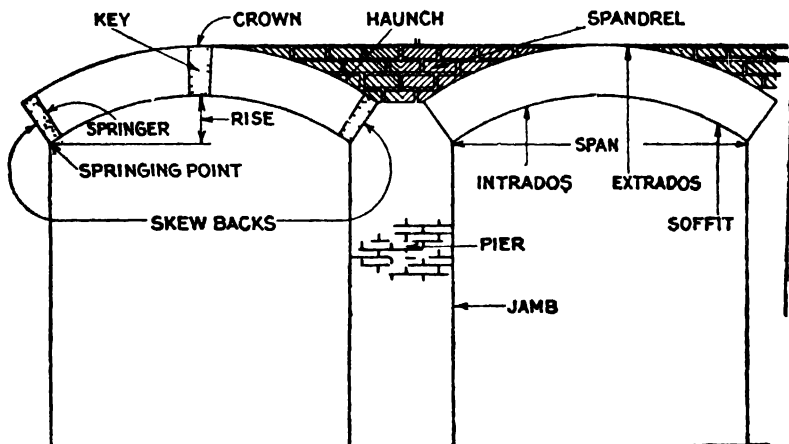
,302.—Two arches springing from a common pier illustrating definitions.
